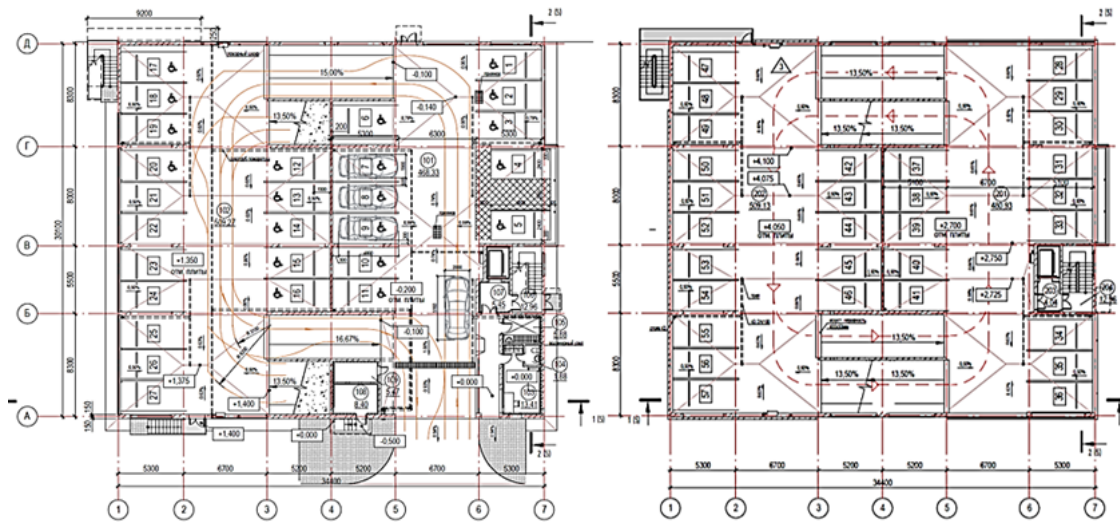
1st floor and typical floor plans of the Novoorlovsky parking
